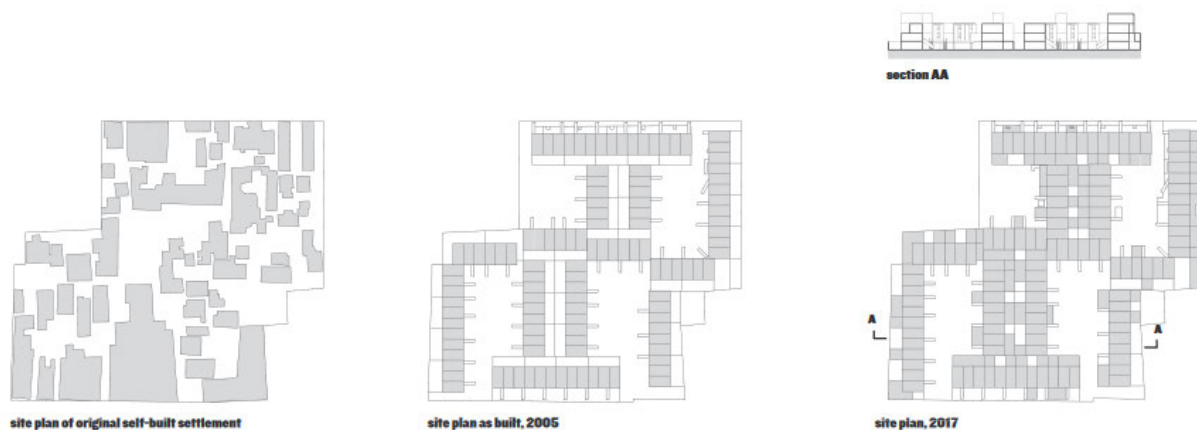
Images of the existing site plan before architectural intervention, what was designed and the incremental growth after design. Source: <https://www.architectural-review.com/buildings/housing/revisit-quinta-monroy-by-elemental>
